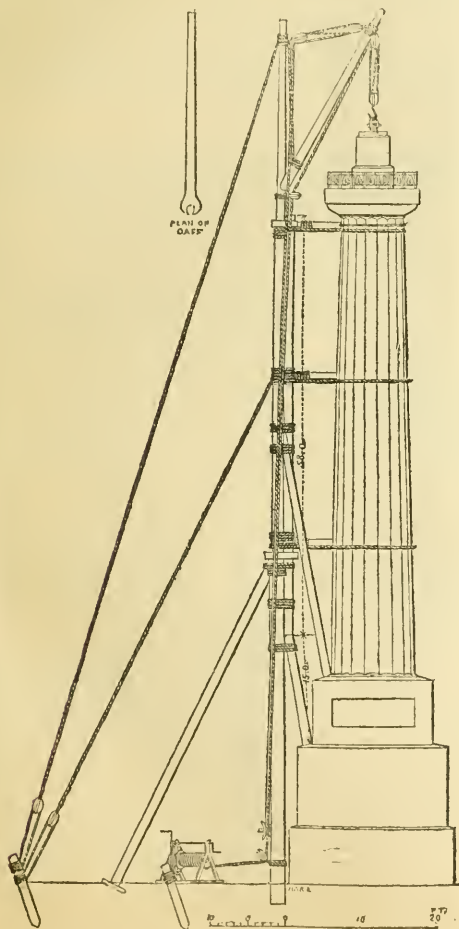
Derrick used for building the Commemoration Column at Devonport.
